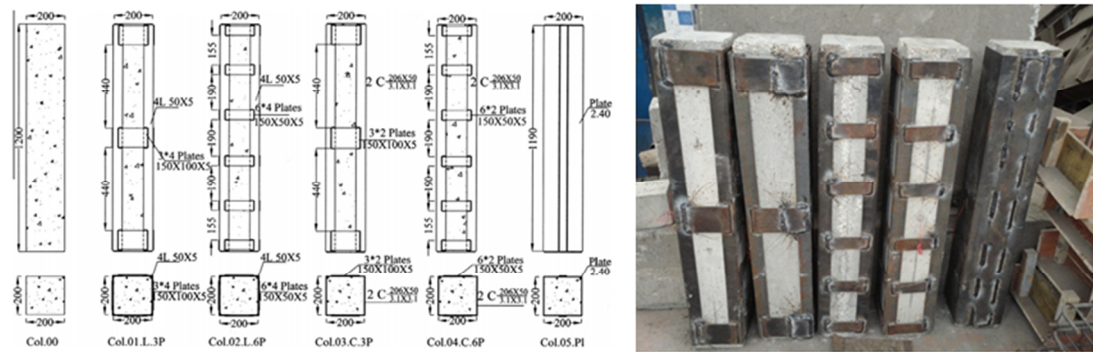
Different steel jacket (steel cages) configurations (Belal, Mohamed, & Morad, 2014)
